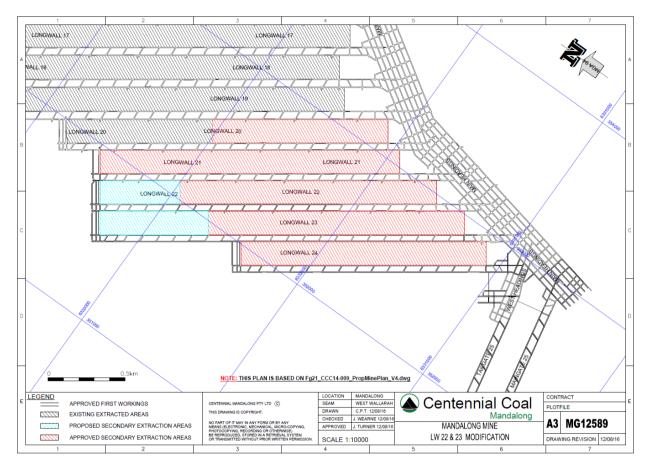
Proposed Secondary Extraction of Longwall Panels 22 and 23
